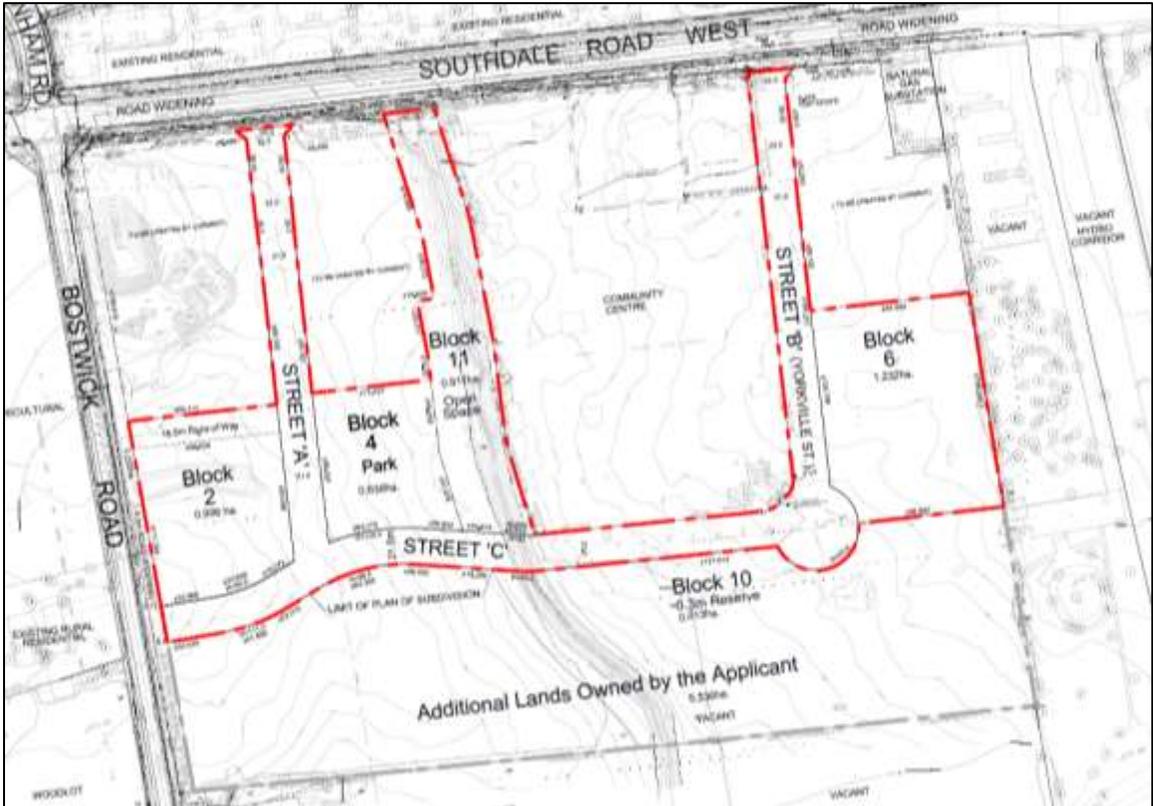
Proposed Draft Plan of Subdivision 39T-18502
